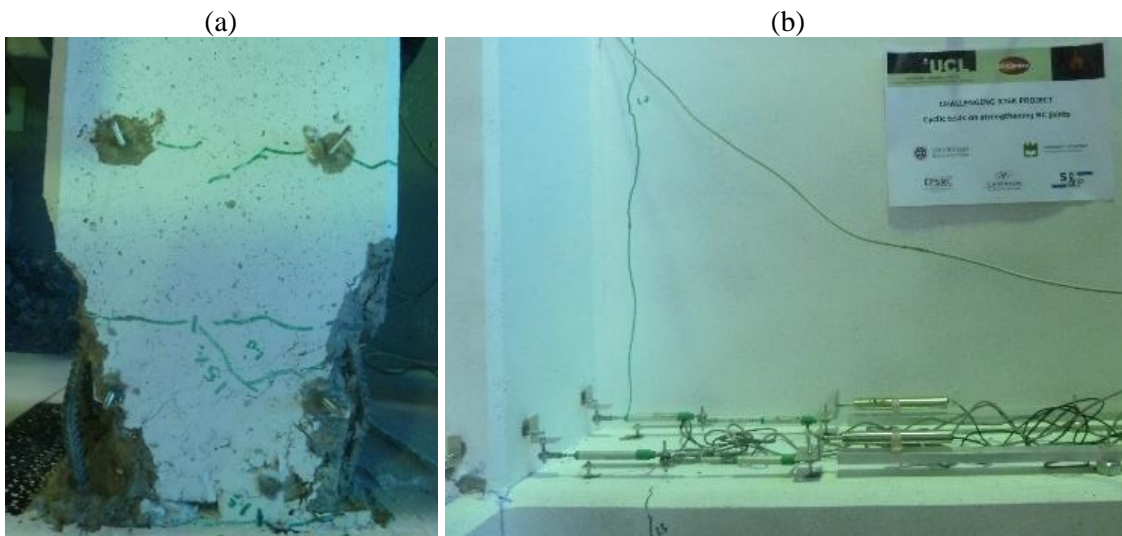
Final damage state in C2; (a) superior column, (b) beam underside.
